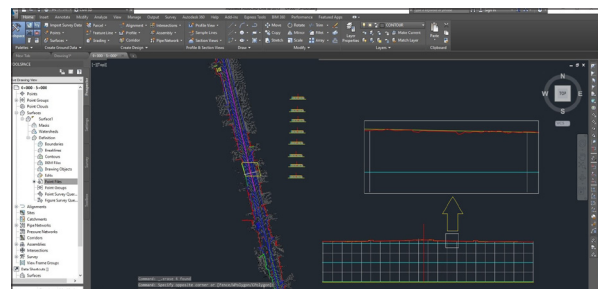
Road surface and Designed cross sections in AutoCAD Civil 3D
